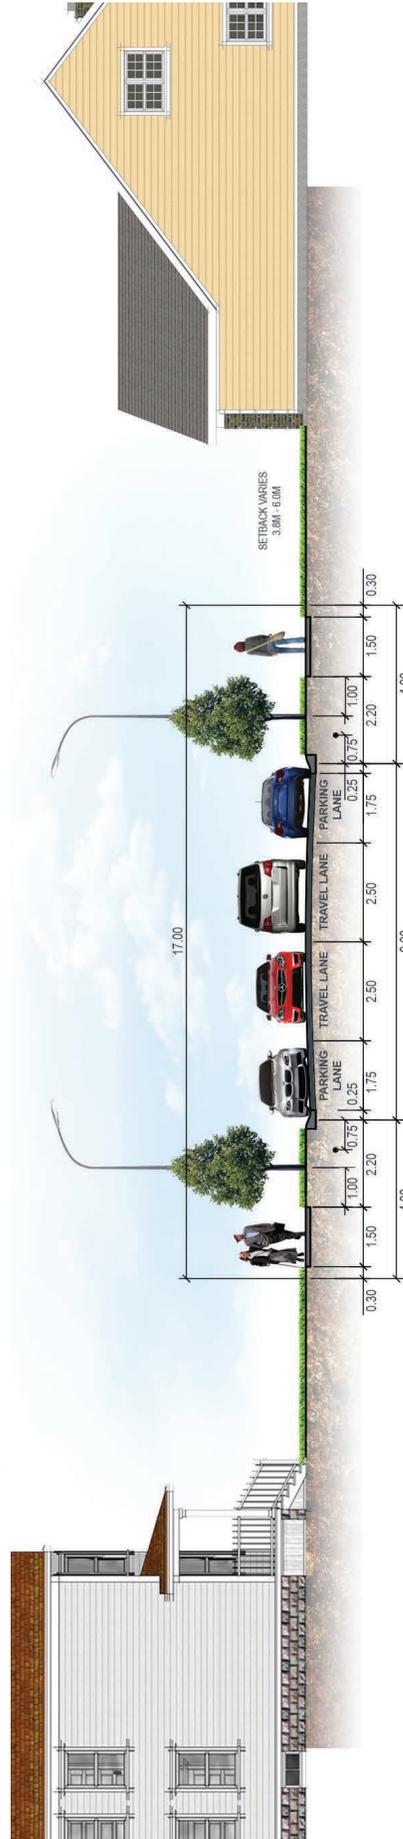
20.0m Undivided Collector Roadway Cross-Section
